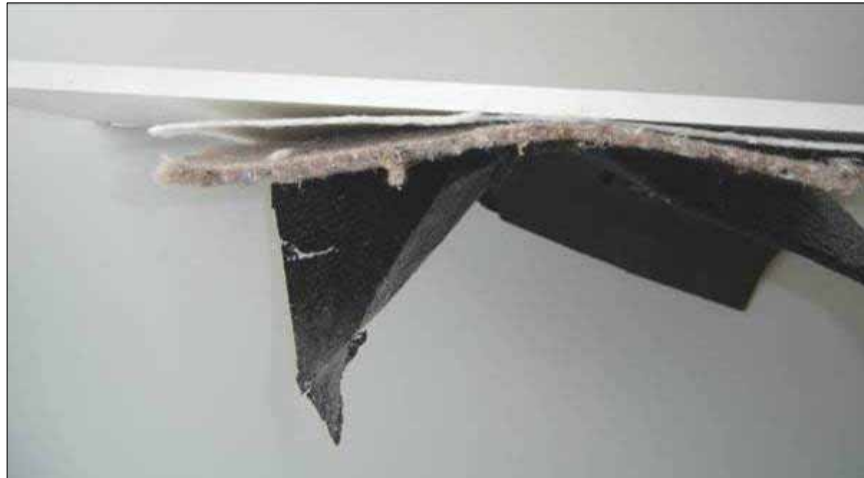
cross section of a living wall system based on felt layers as substrate. Characteristic for these living wall systems are the minimum construction thickness (2 cm).
